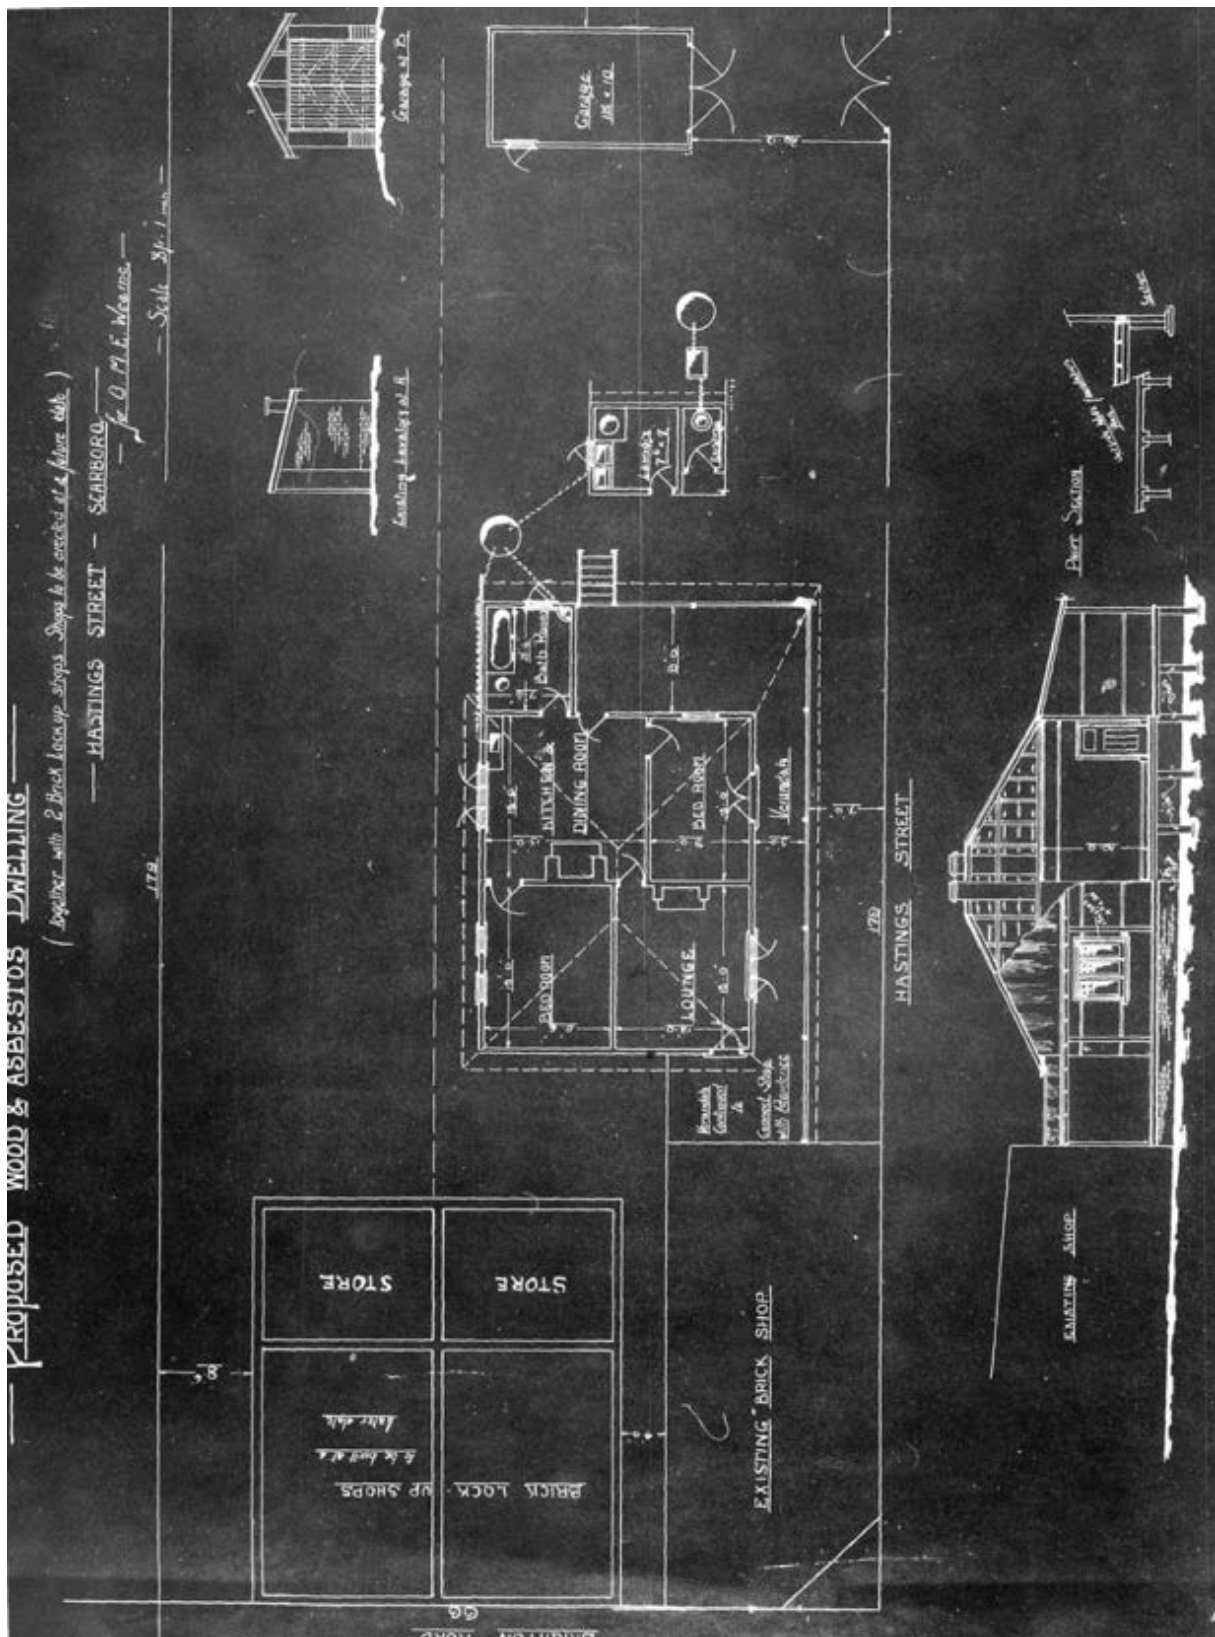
BUILDING LICENCE PLANS FOR THE PROPOSED DWELLING BEHIND THE SHOP DATED 1945 (STATE RECORDS OFFICE)
